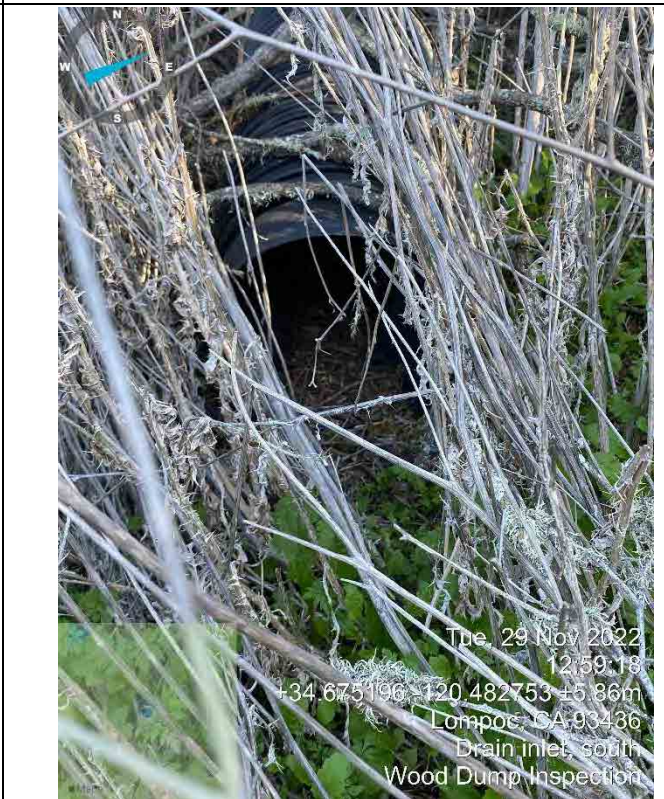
Southern 12" HDPE Pipe Outlet– pipe in good condition but obstructed with vegetation and debris buildup (facing northeast)
